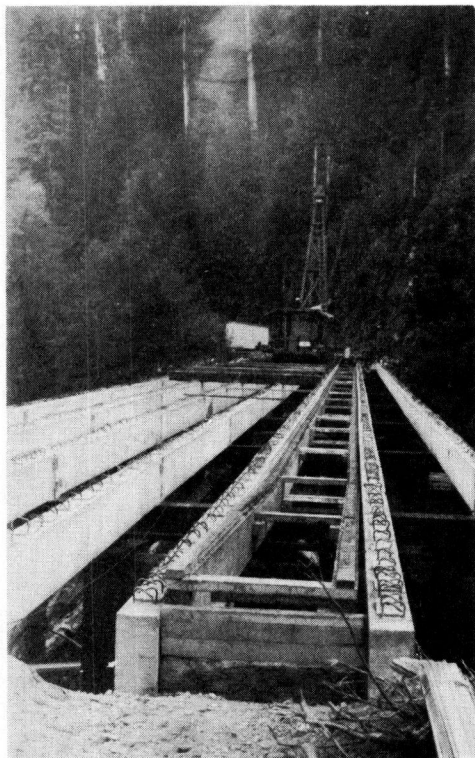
Baker River Bridge - Placing Precast Stringers with Pile Driver - Tram Used for Hauling Stringers
